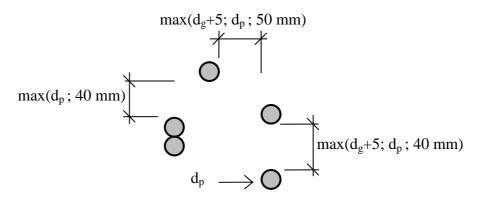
Detailing provisions of post-tensioned reinforcement according to EN1992-1-1
